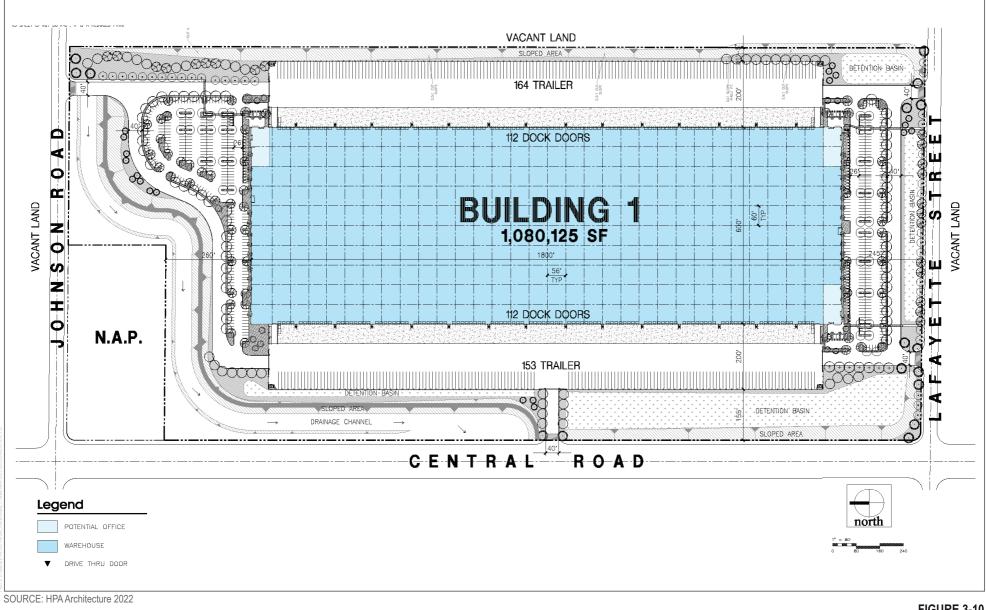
Building Site Plan 1M Warehouse Project
